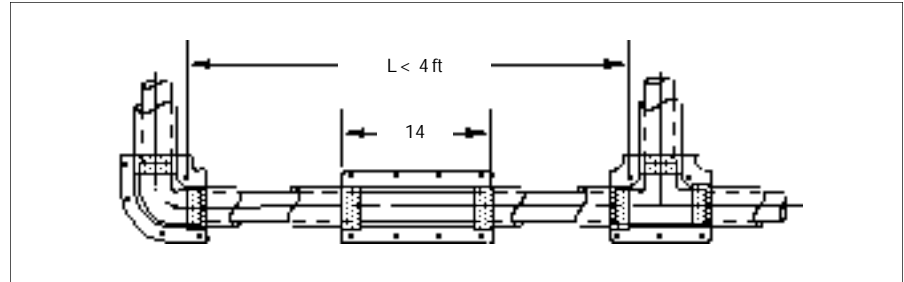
Contain short runs with a standard containment coupling and short containment pipe nipples.
